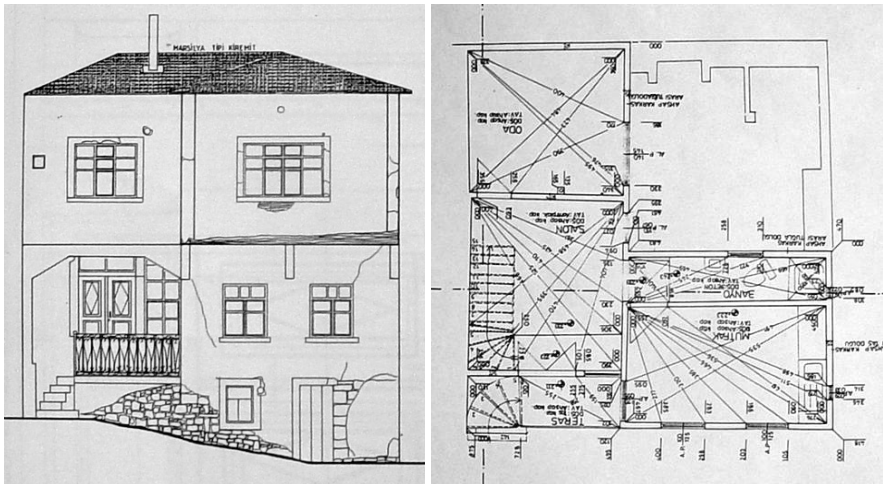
Suheyly Caner Front Elevation and First Floor Plan
